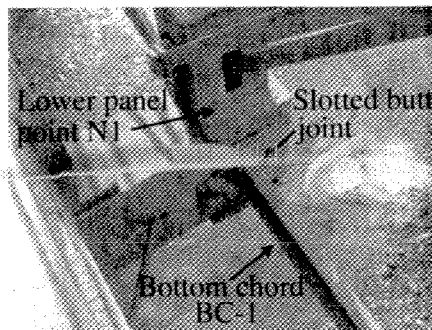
Lower chord to vertical connection detail. The U-shaped, slotted butt joint is capable of transmitting only compressive forces due to lack of bolts, rivets, or welds at interface of BC1 and N1.
